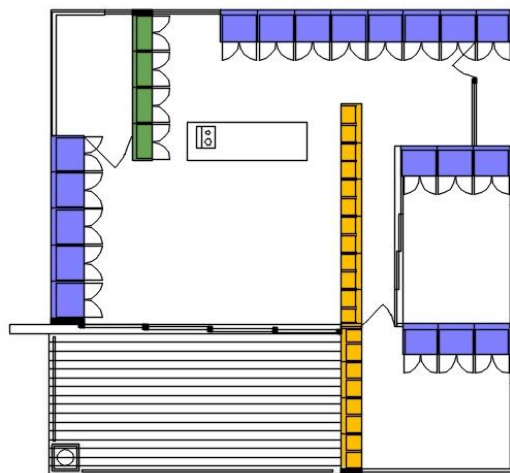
Shigeru Ban Furniture house 1 plan
